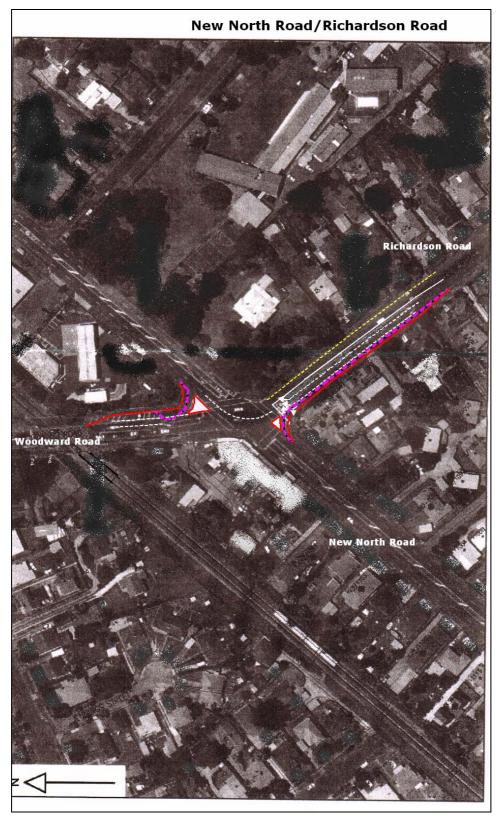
Feasibility plan of the New North Road/Richardson Road intersection (not to scale).
